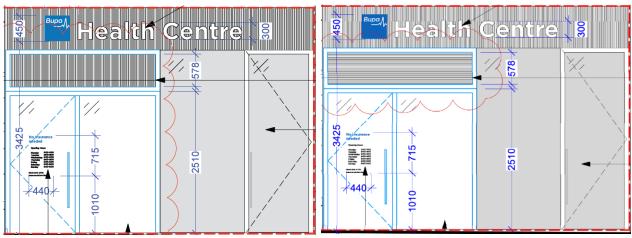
Elevations of the consented (left) and the proposed (right) cladding systems, prepared by Lusted Green
